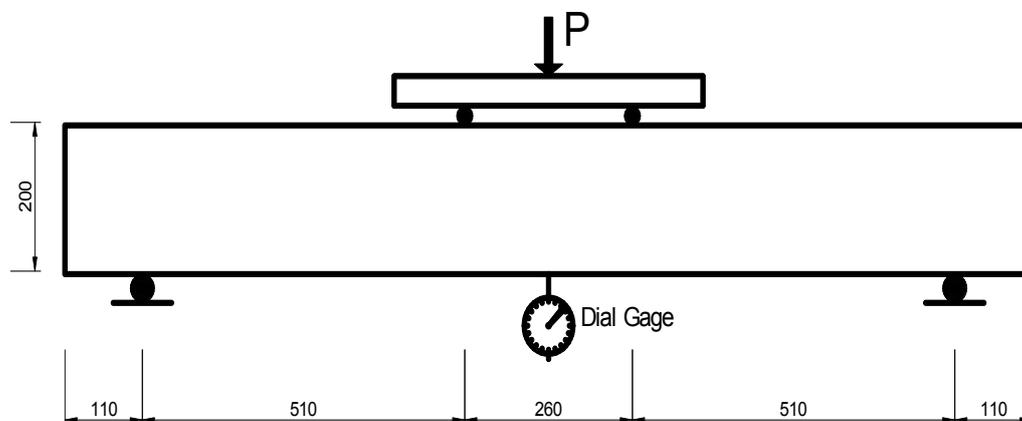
Loading arrangement of the tested beams (All dimensions are in millimeter)
